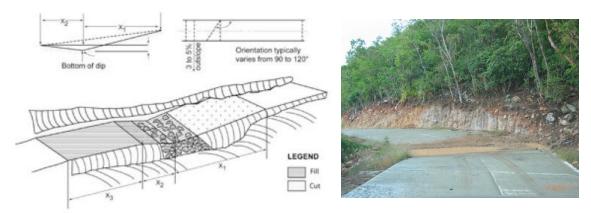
Dip schematic for unpaved road (left) and one used on a paved road (right) as an alternative to convey flow from surface and from inslope ditch to outslope.
